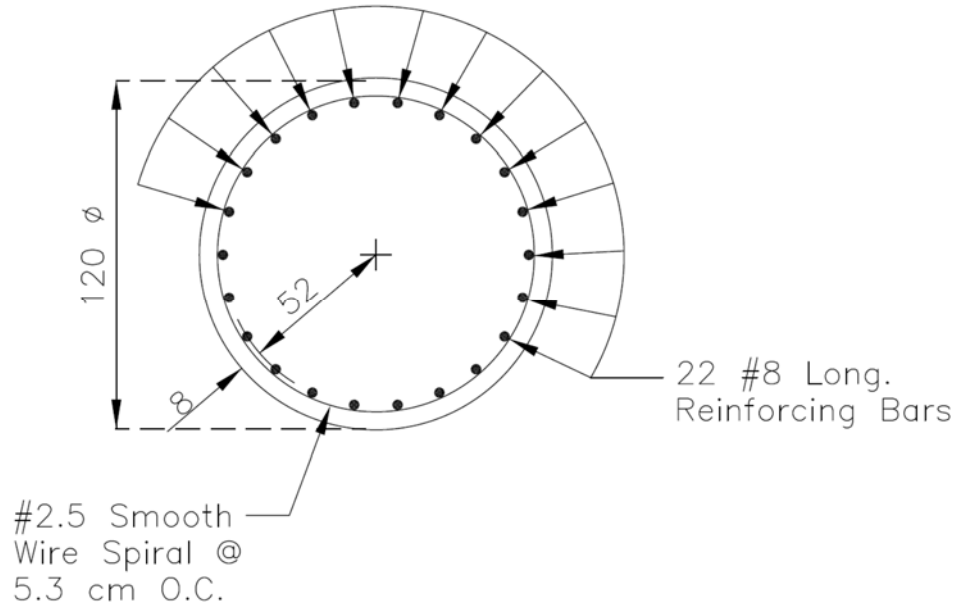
Highway bridge extended shaft column structural details. All dimensions in centimeters. Adapted from 1998 bridge construction plans (SCT, *personal communication*, 2013).
